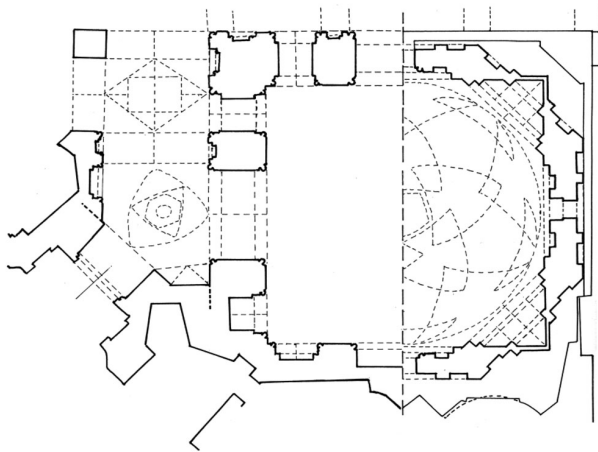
Plan of north dome (photogrammetric view; after Laleh).
